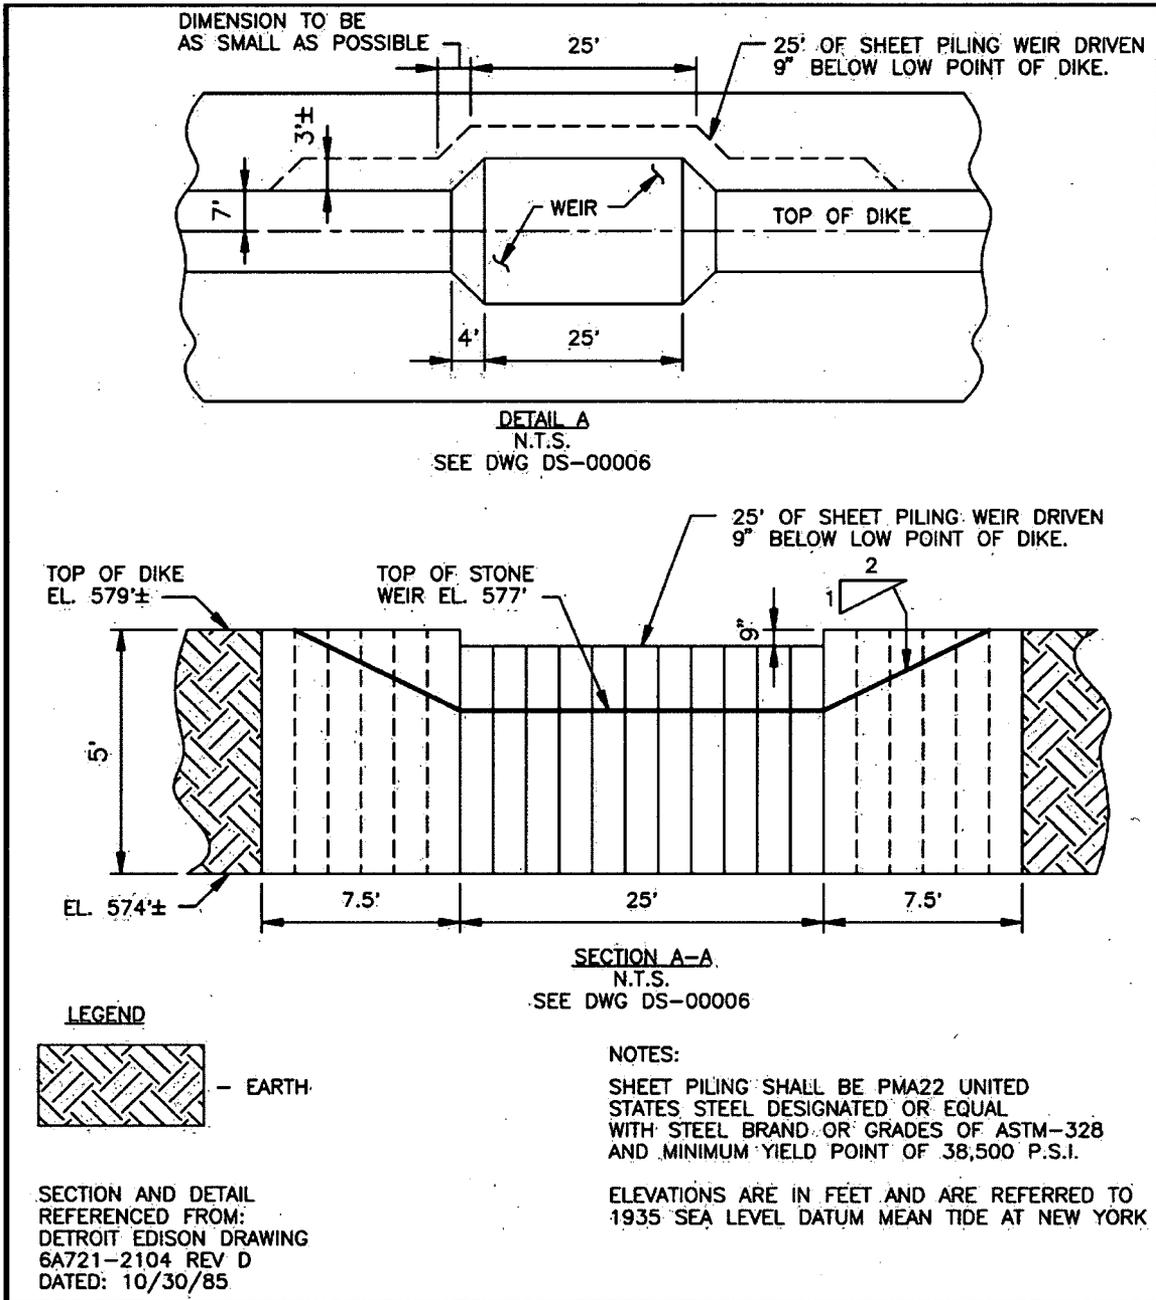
Dredge Disposal Storage Basin Cross Sections
